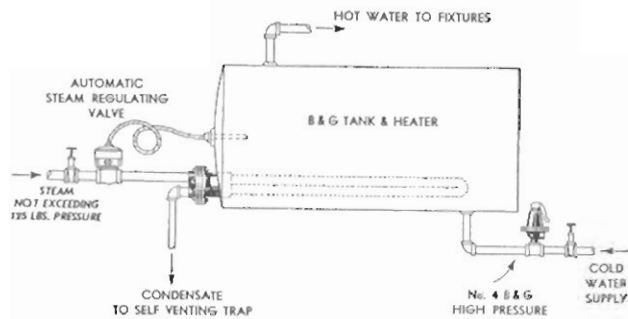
B & G Tank and Heater installation, heated with high pressure steam.
